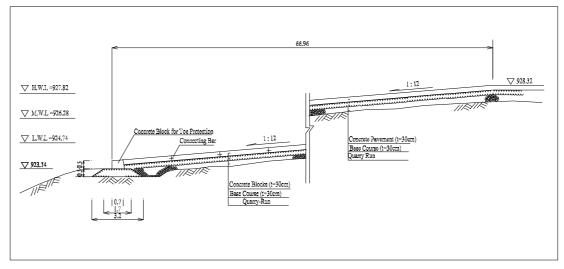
Typical Cross Section of Onshore Ramp
